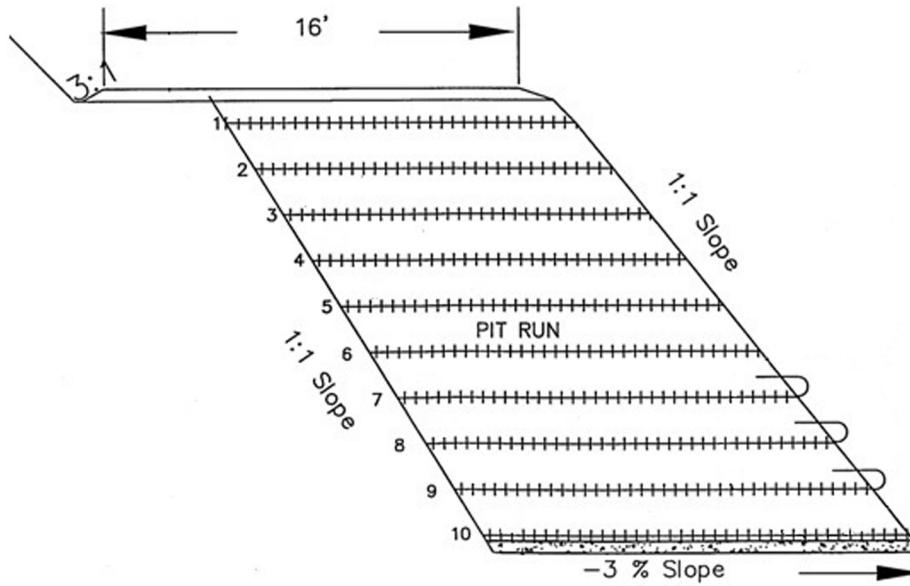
General layout of deep patches on Road 45 in Mount Hood National Forest.
